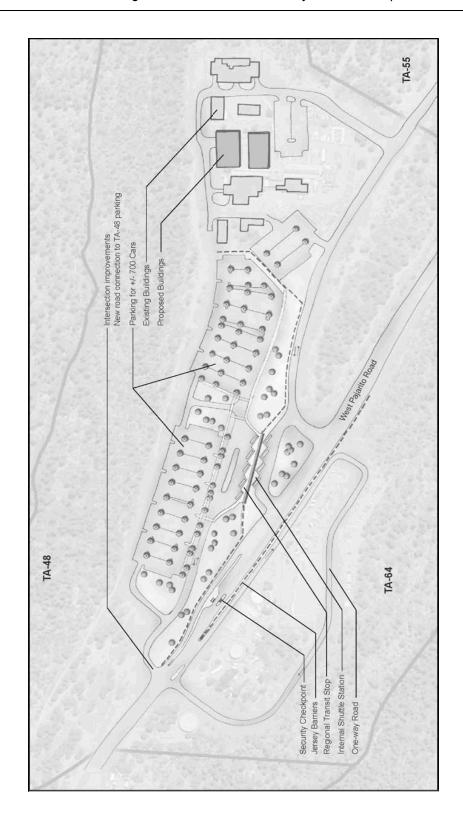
Conceptual plan for proposed modifications around TA-48.
